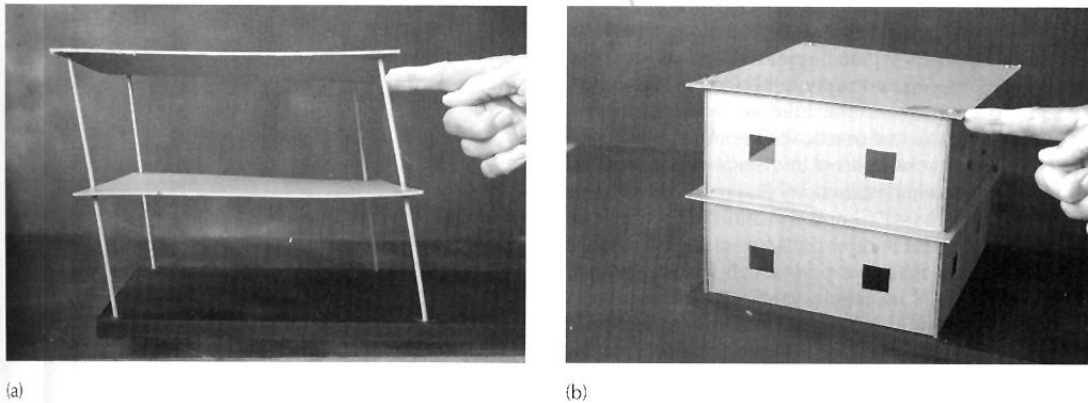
(a, b) Structural frame stabilized by adding shear panels.
